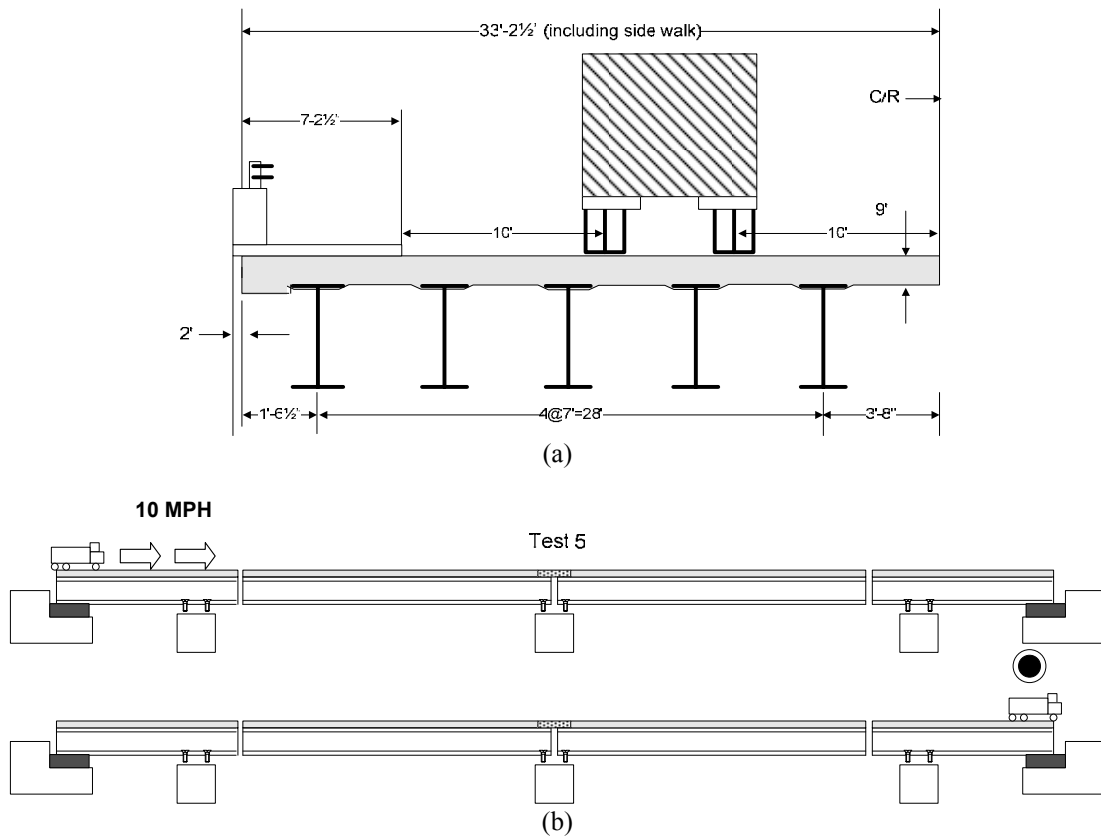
(a) Transverse truck location of Test #5; (b) Load plan for Test #5
